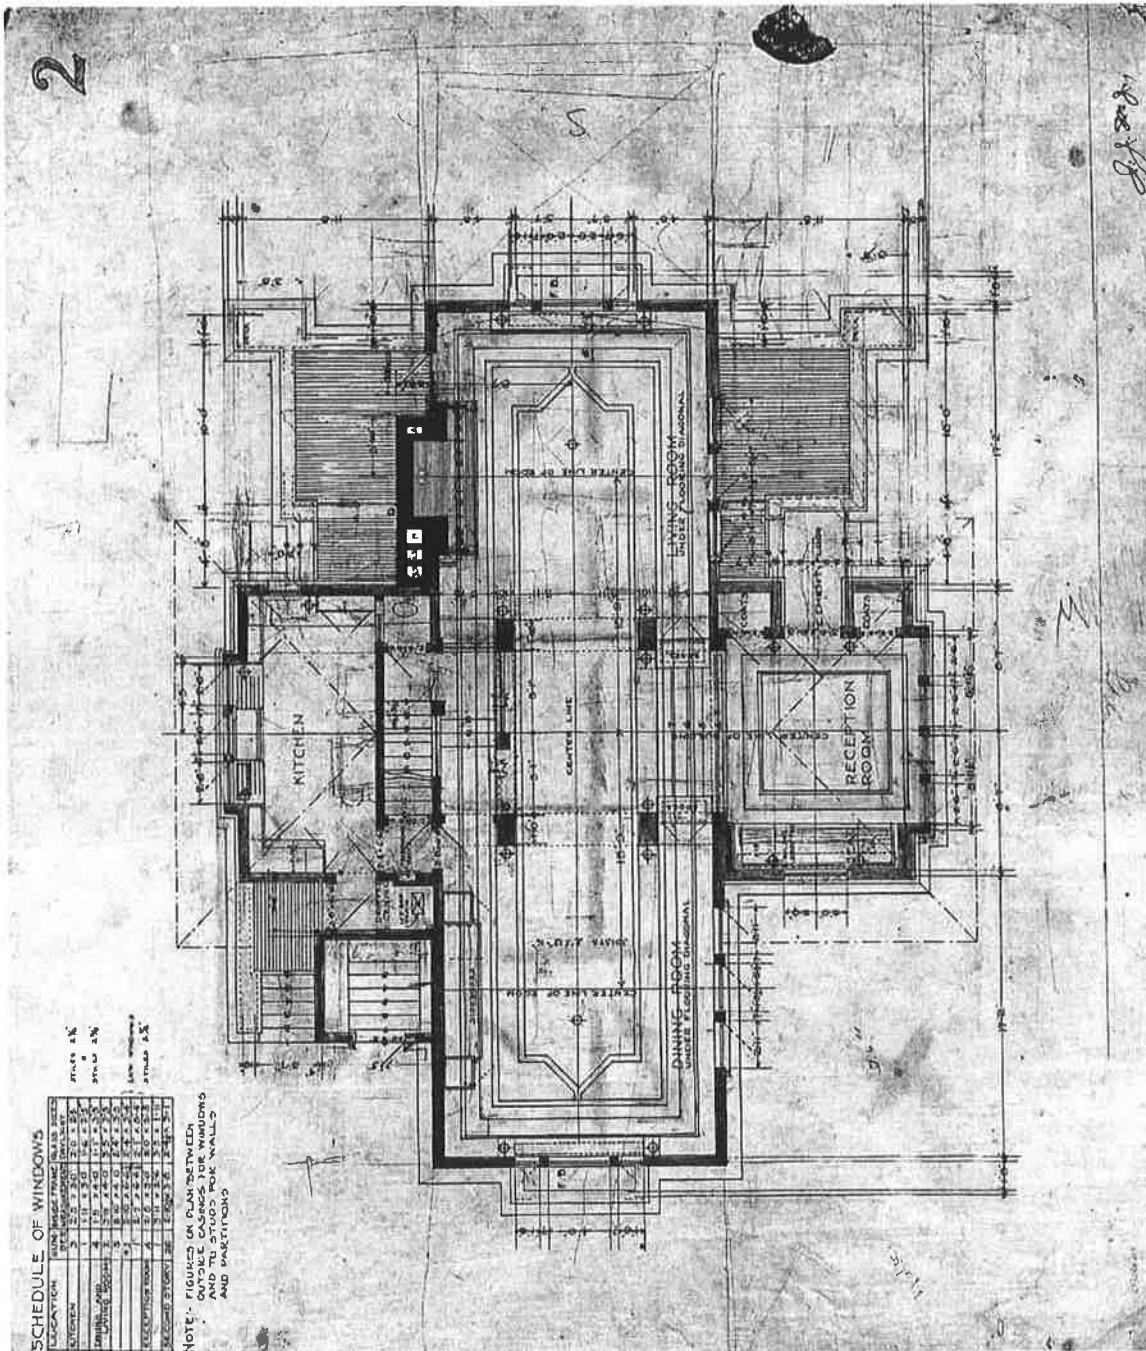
Original 1903 Joseph J. Walser House first floor plan
